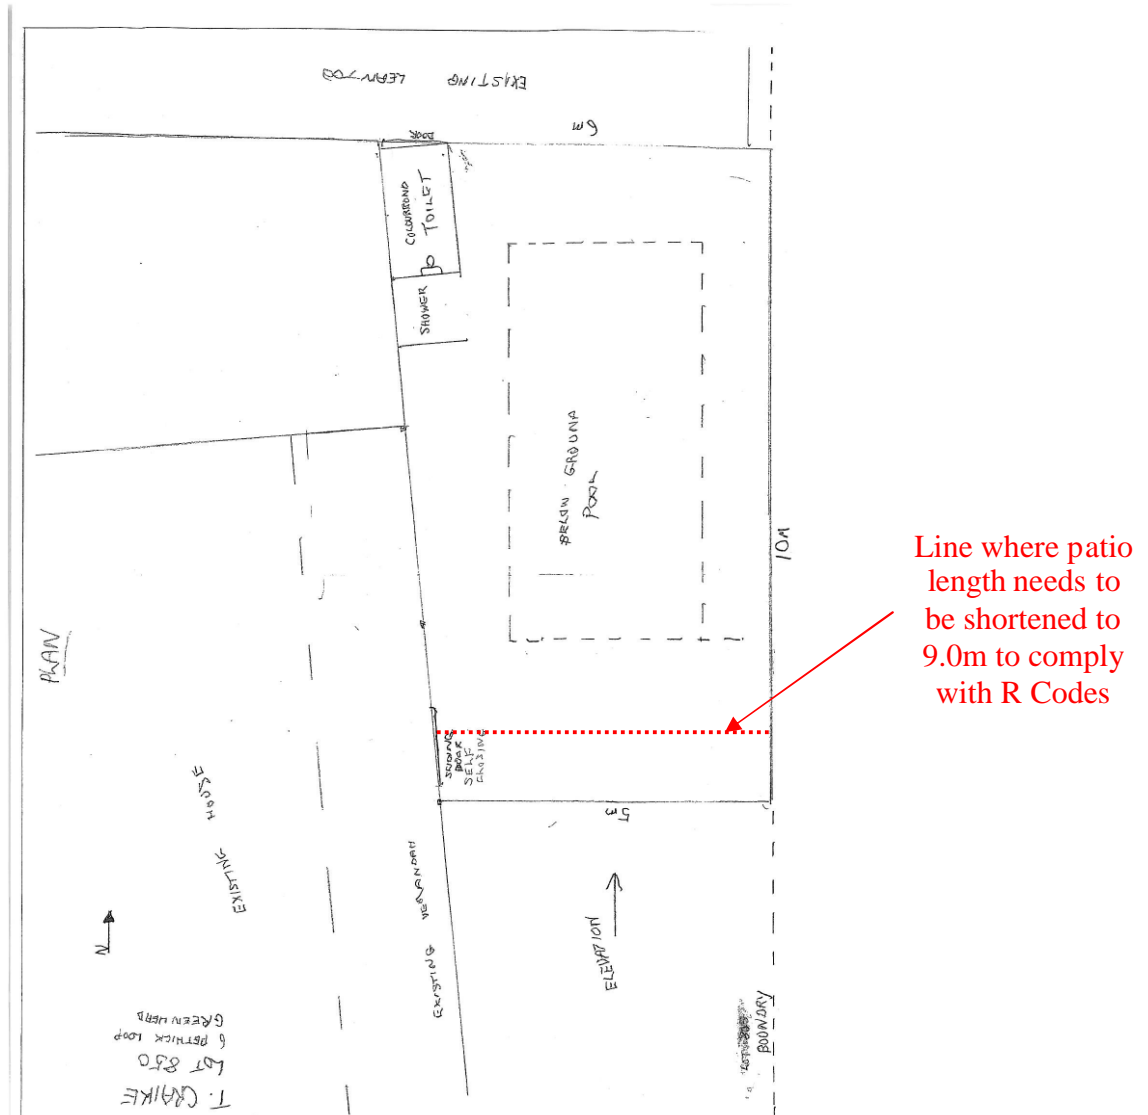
Site Plan of Proposed Patio Structure extract from Application
